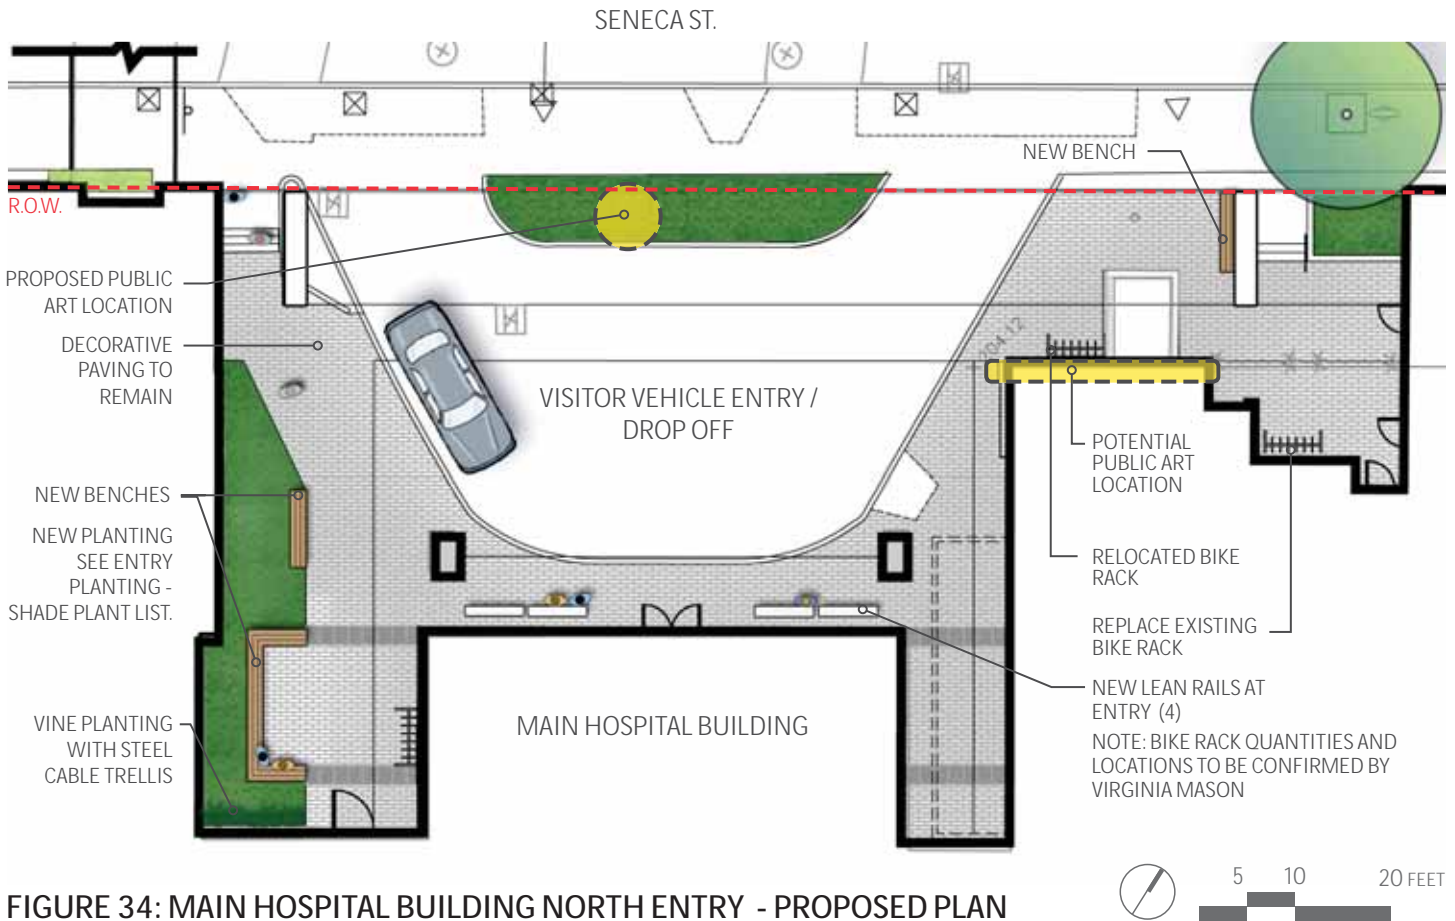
MAIN HOSPITAL BUILDING NORTH ENTRY - PROPOSED PLAN
